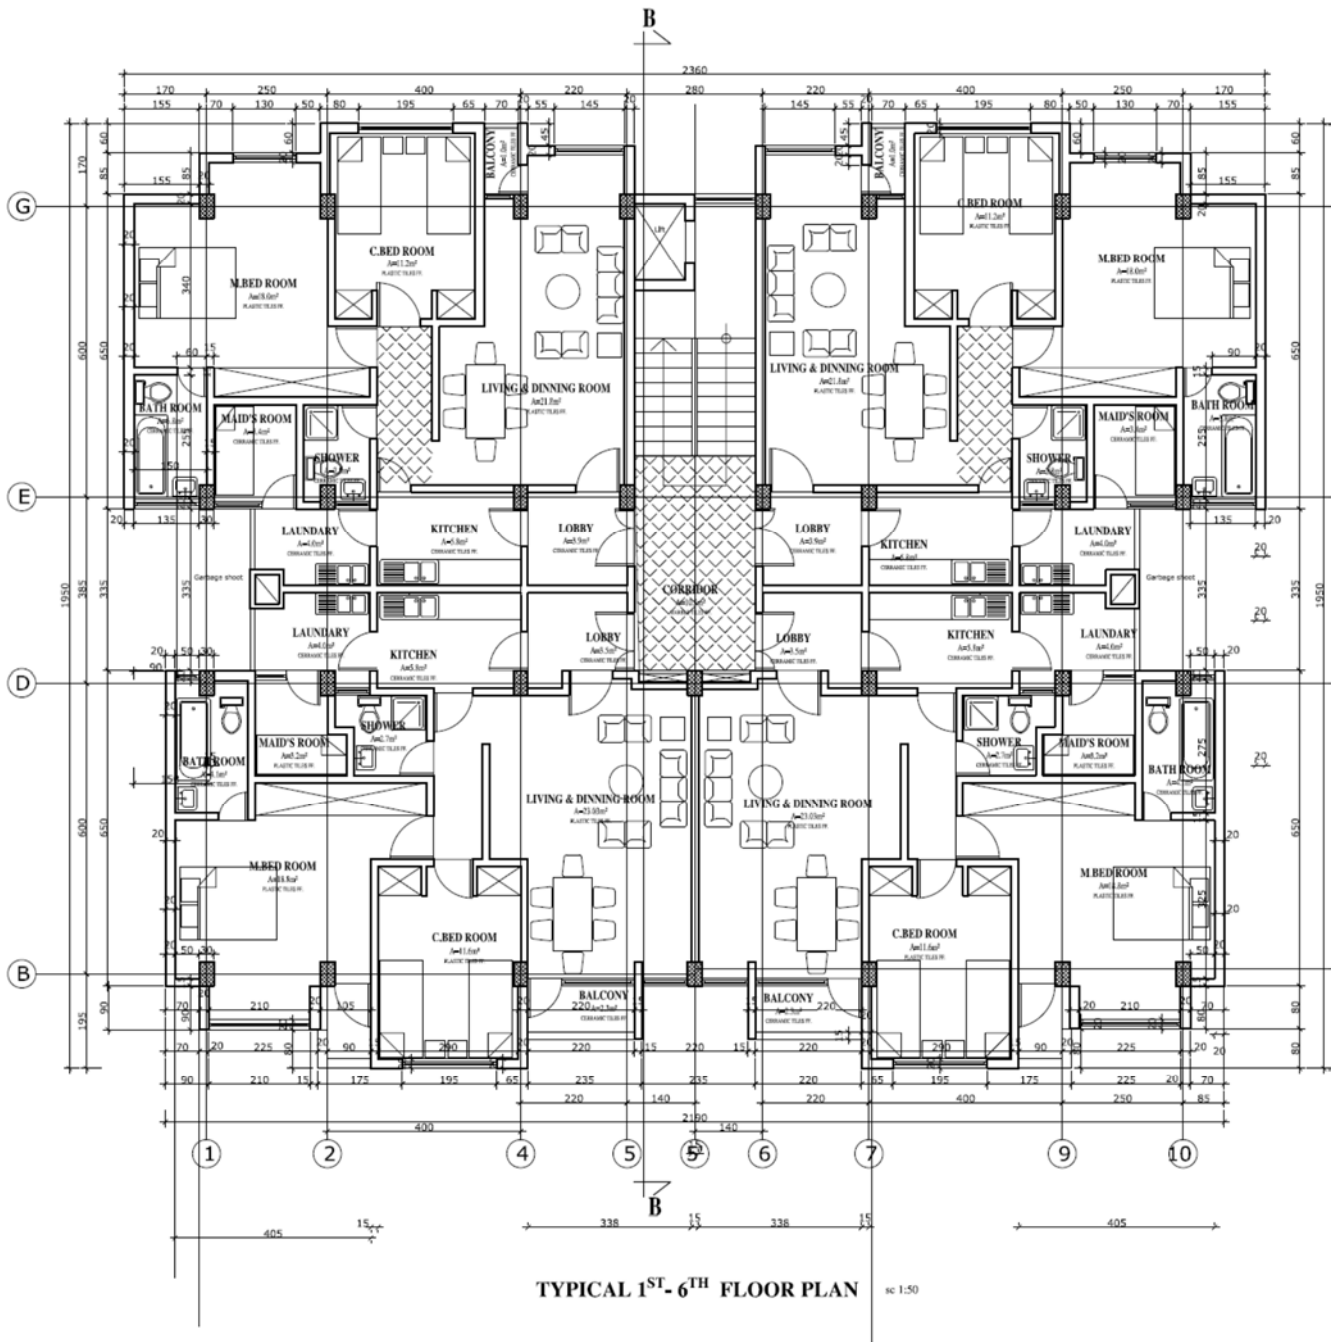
Typical floor plan , 1st-6th of the residential floor of *Semay-Tekes* cooperative
